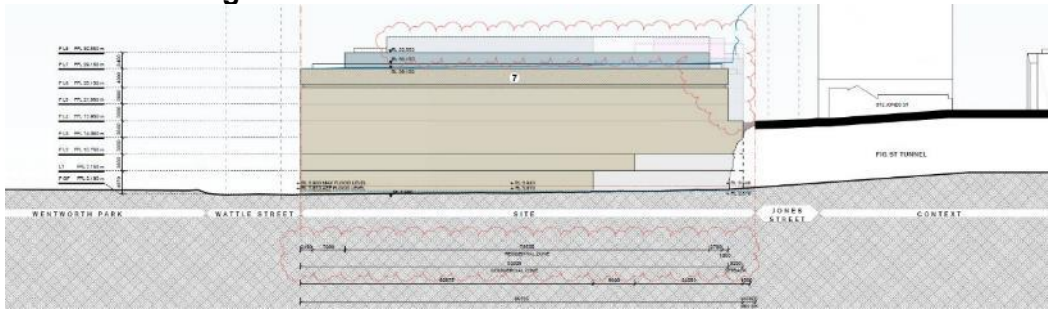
Envelope plans: Approved and proposed Jones Street Elevation
